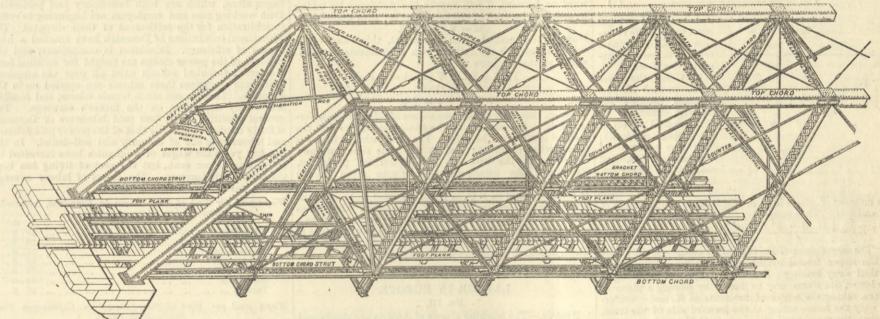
ISOMETRICAL VIEW OF AMERICAN TRUSSED BRIDGE.
